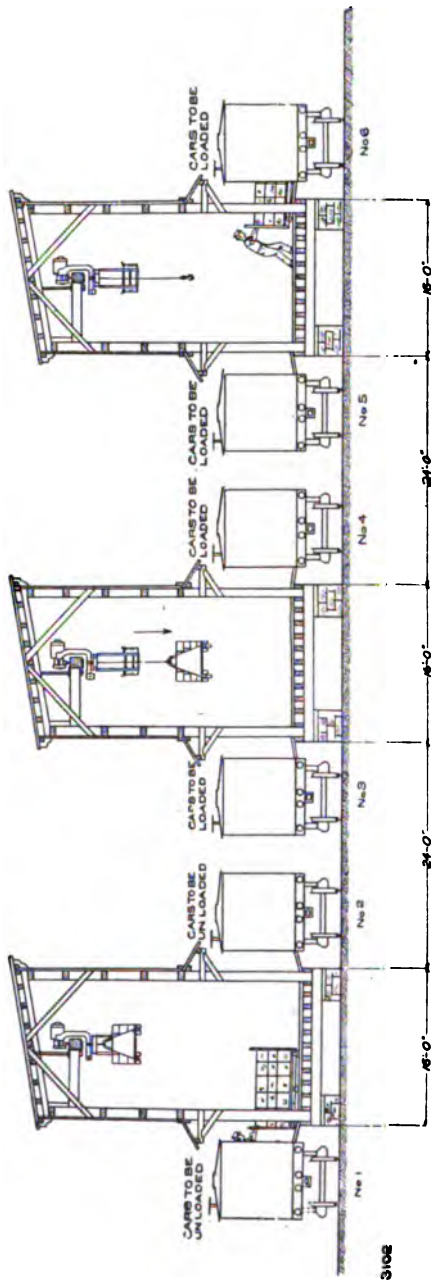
Sectional view of carrier system at Bergen, N. J.—Erie Railroad.
